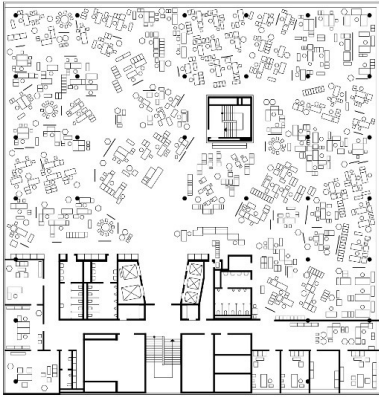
Floor plan of a typical floor in the Osram office building in Munich, Germany, 1965; architect: Walter Henn. Own elaboration, based on (HENN Architecture, n.d., photo 1)
